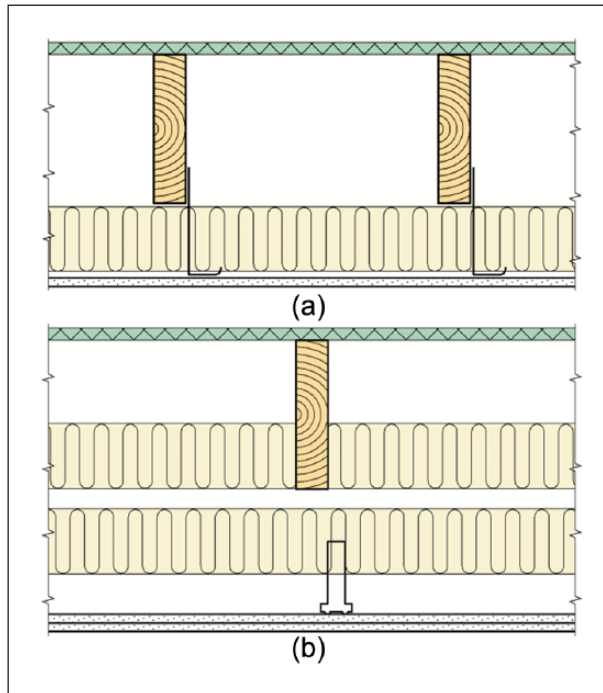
Common types of French wooden joist constructions: (a) type A, FS-CS and (b) type A, FS-CN.
